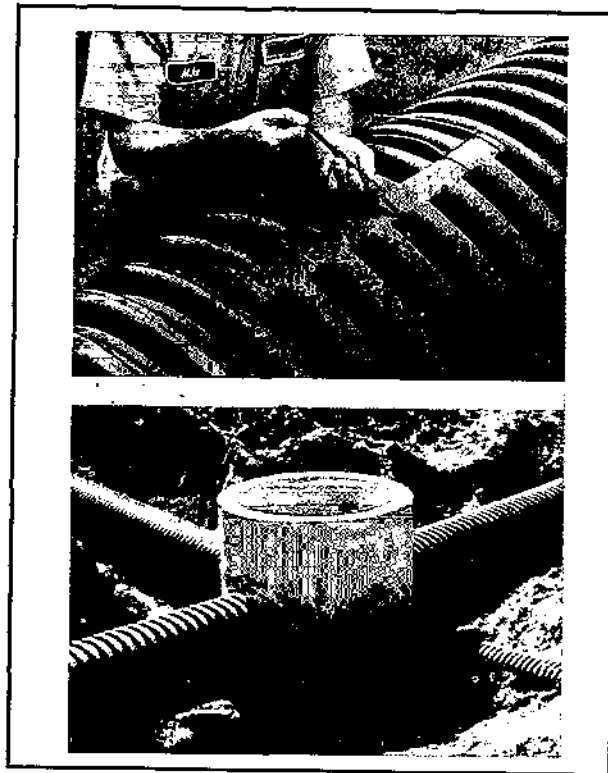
Photograph of HDPE Corrugated Pipe Being Coupled and After Installed.
